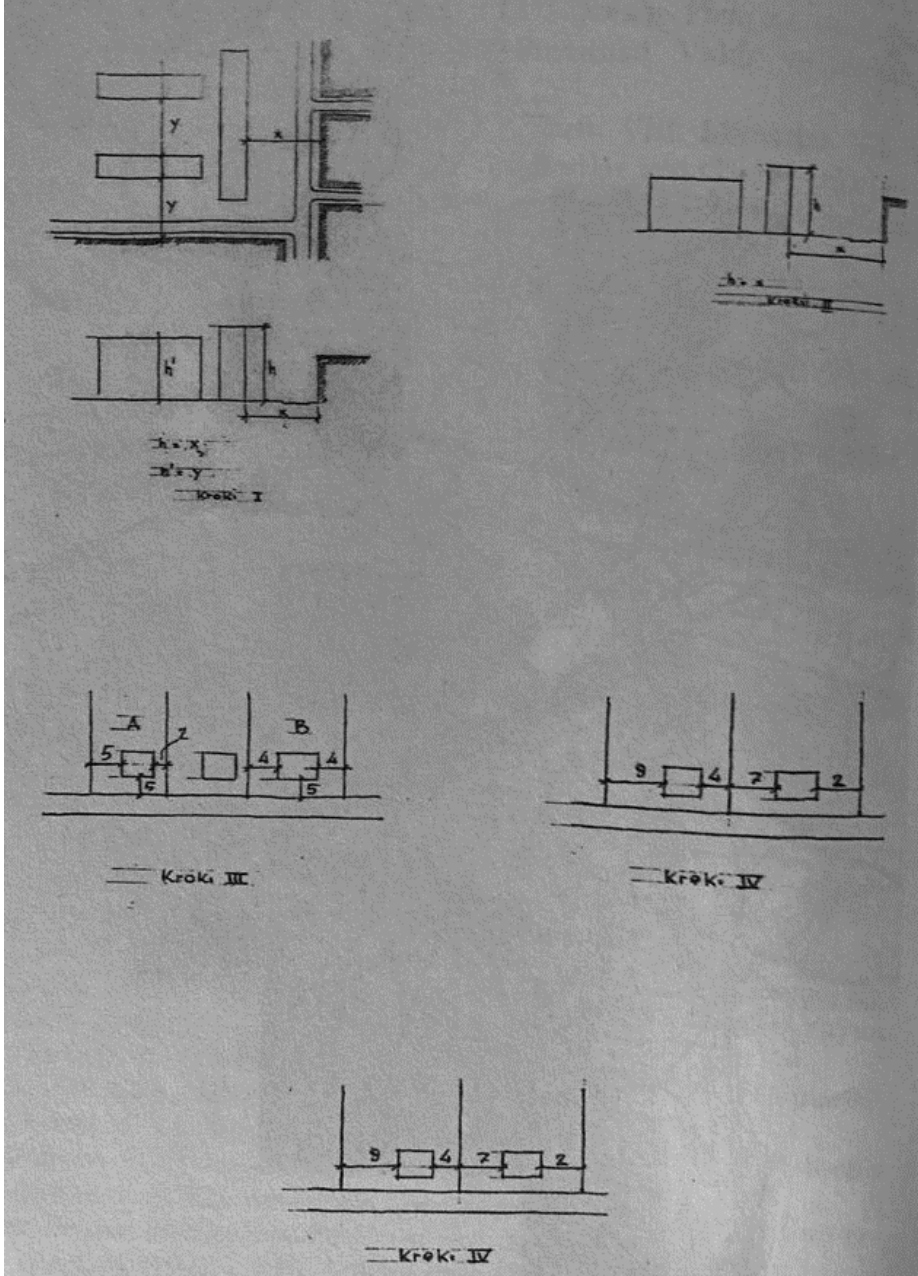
1957 Ankara Plan Report, 15-17, Building setback distances: Diagram I-IV.
